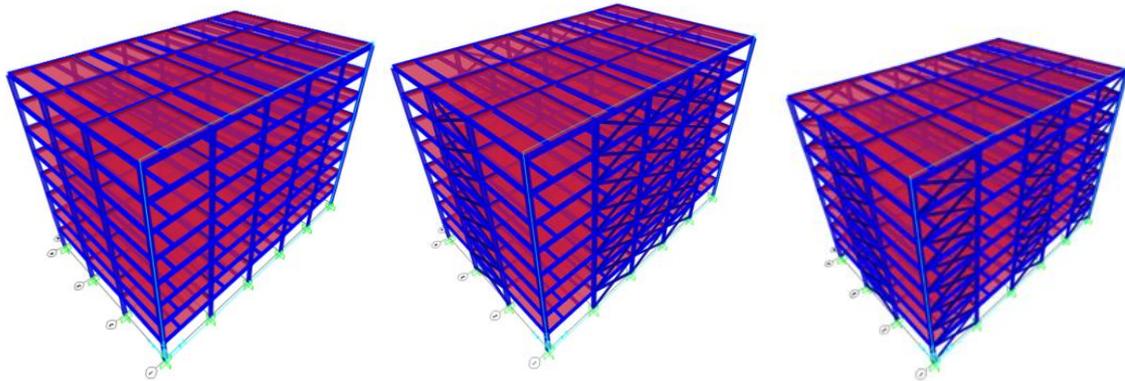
3D models of 1) Building without bracing. 2) Building with X bracing with neighbor arrangement. 3) Building with X bracing with alternate arrangement.
